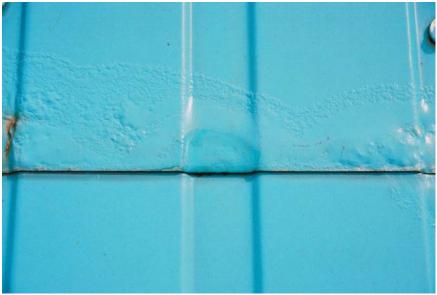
Paint blistering on a prepainted GALVALUME[®] roof caused by poor end lap sealing.
